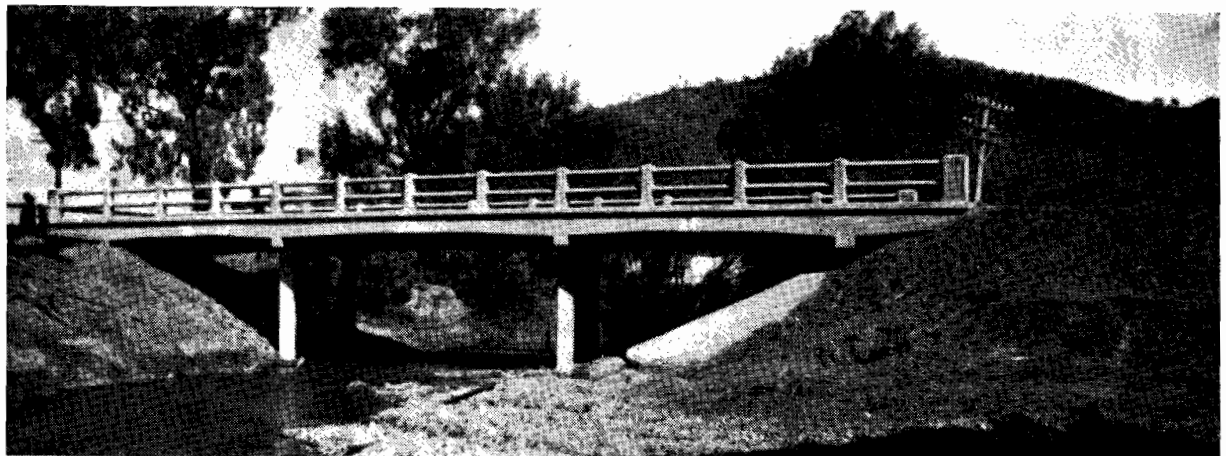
Omeo Highway. Bridge over Swift's Creek replacing narrow, decrepit, old timber structure.
